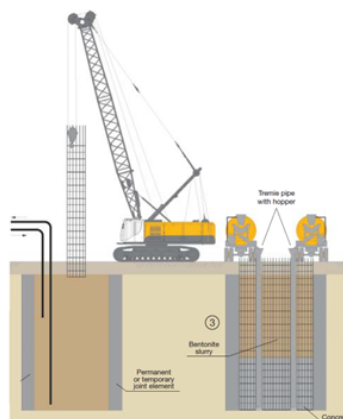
Diaphragm wall construction. Generalized process, not project specific.
